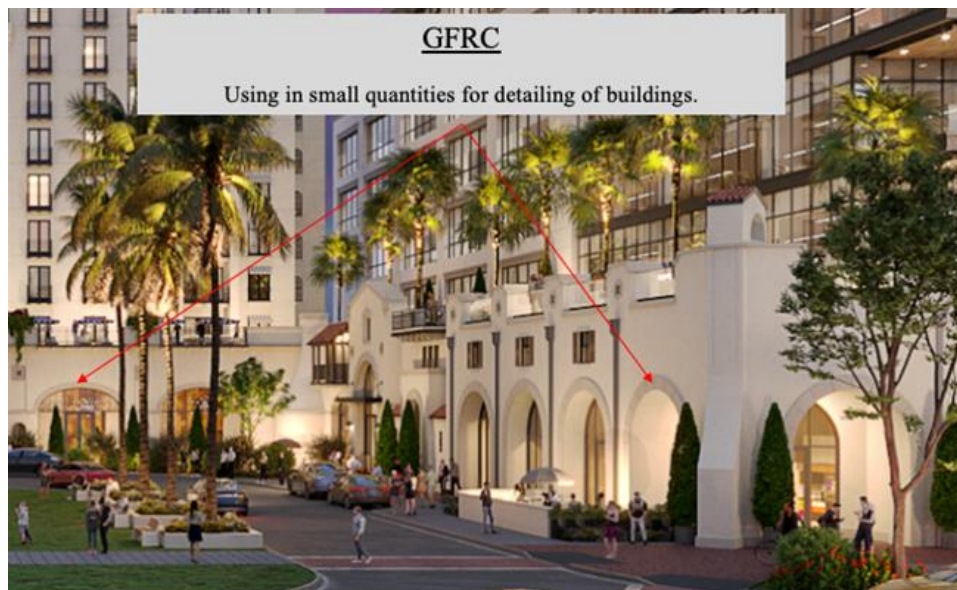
A rendering of the office building, which shows an example of how and where GFRC will be utilized.
